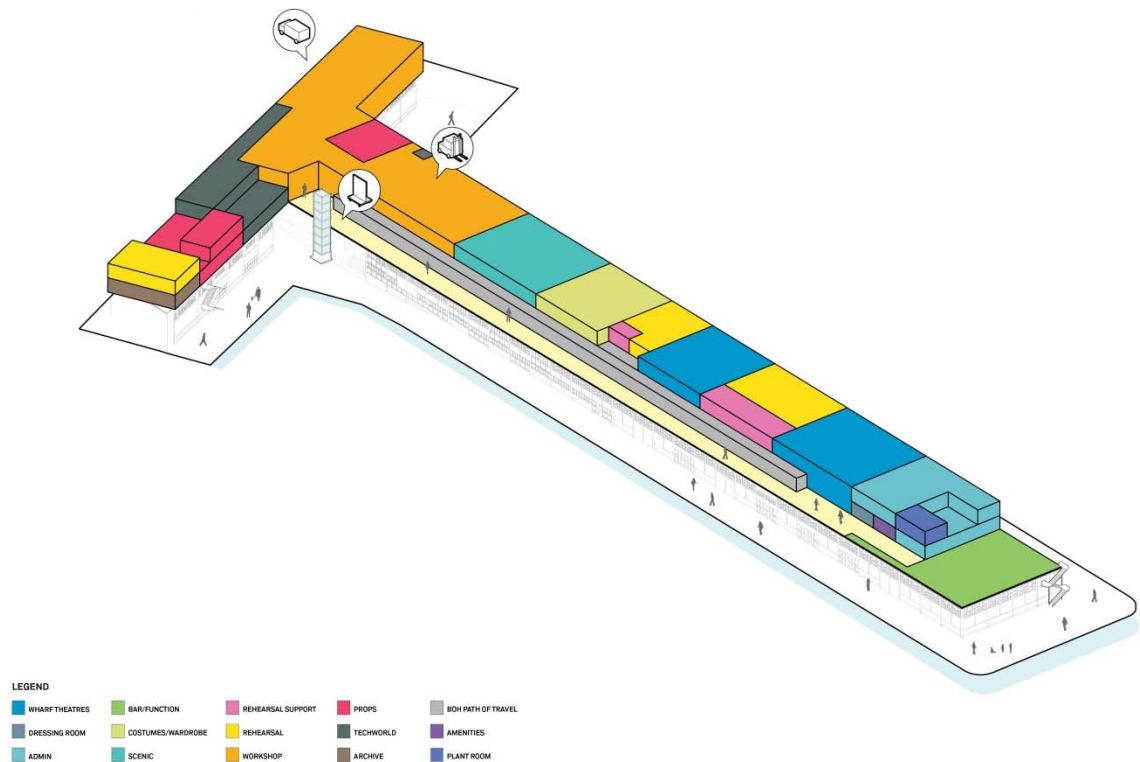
Existing STC facilities (refer Attachment A for larger plan)
